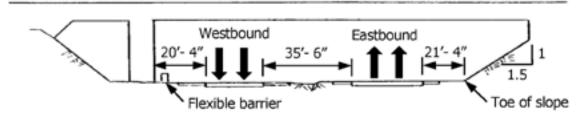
Bridge elevation view of horizontal clearances for separate westbound and eastbound highway features below the bridge, with a flexible barrier.
